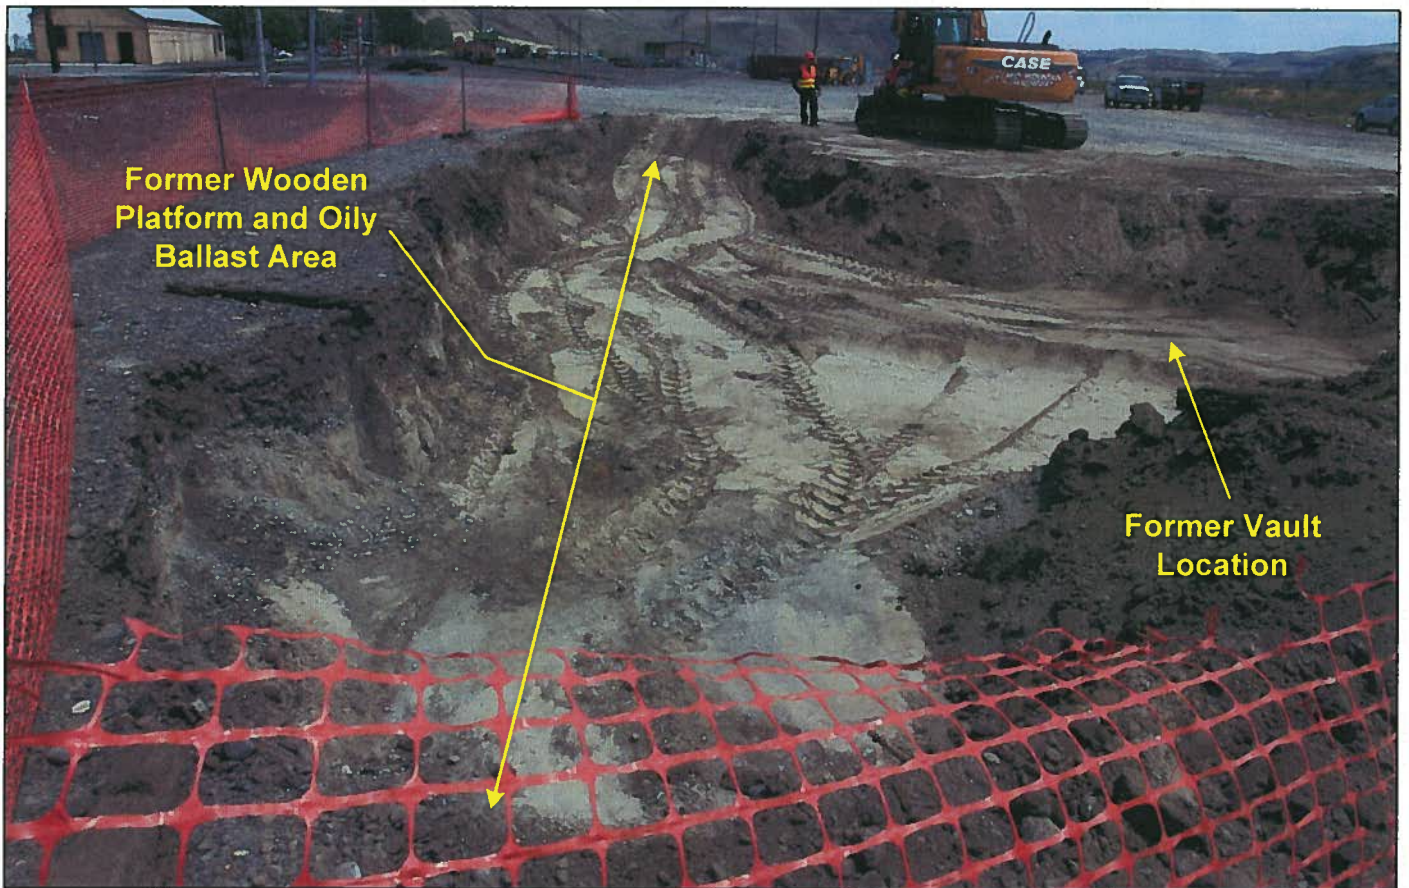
Wooden platform timbers, oily ballast, and underlying silt/sand material (typical).
